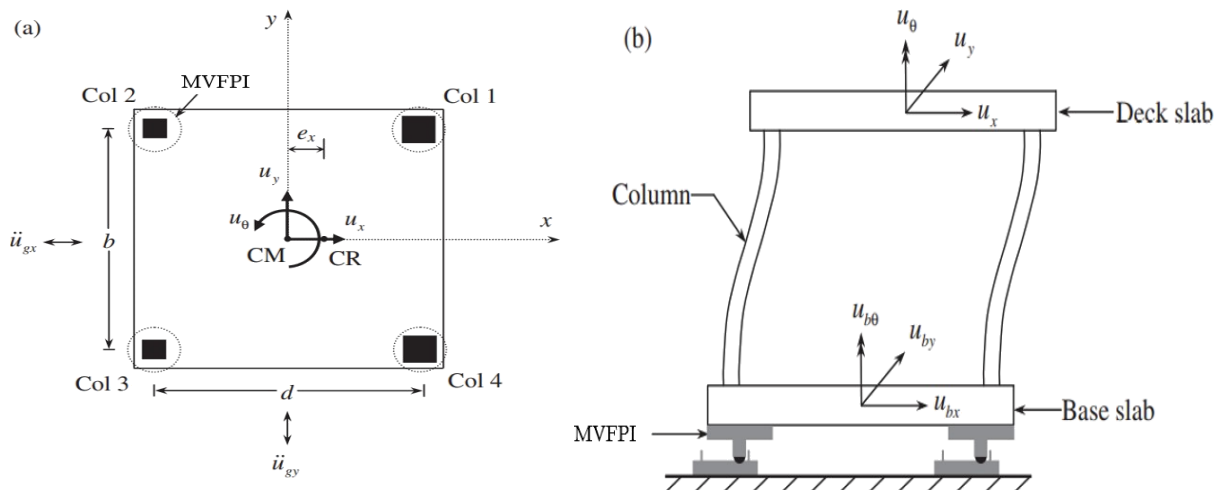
Structural model for MVFPI (A) Plan, (B) Elevation
